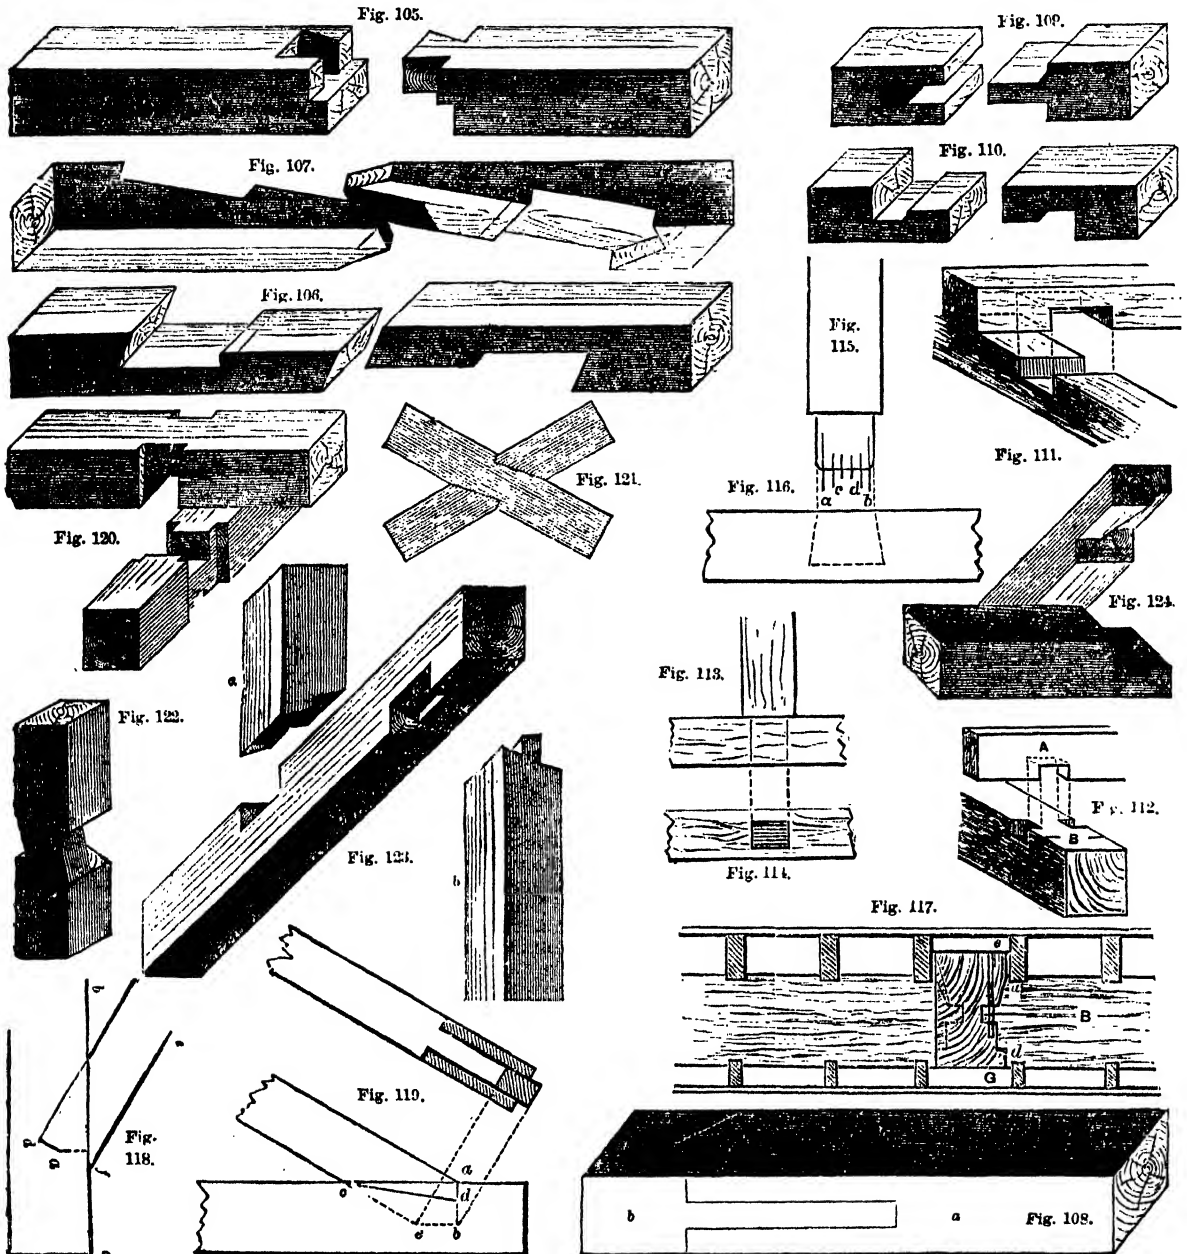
is a joint effected by a tongue or tenon in the one part (b) fitting into a mortise or slit of similar width in the other (a). This is considered a very good joint when the beam so joined is supported by a column underneath the joint. In such cases it may be placed on its narrow side, so that the sides of the tongue may be vertical. The sides of the part a then strengthen the beam against lateral strain. This method, too, is found very effective when used vertically, there being no possibility of the parts slipping over each other. In this case
